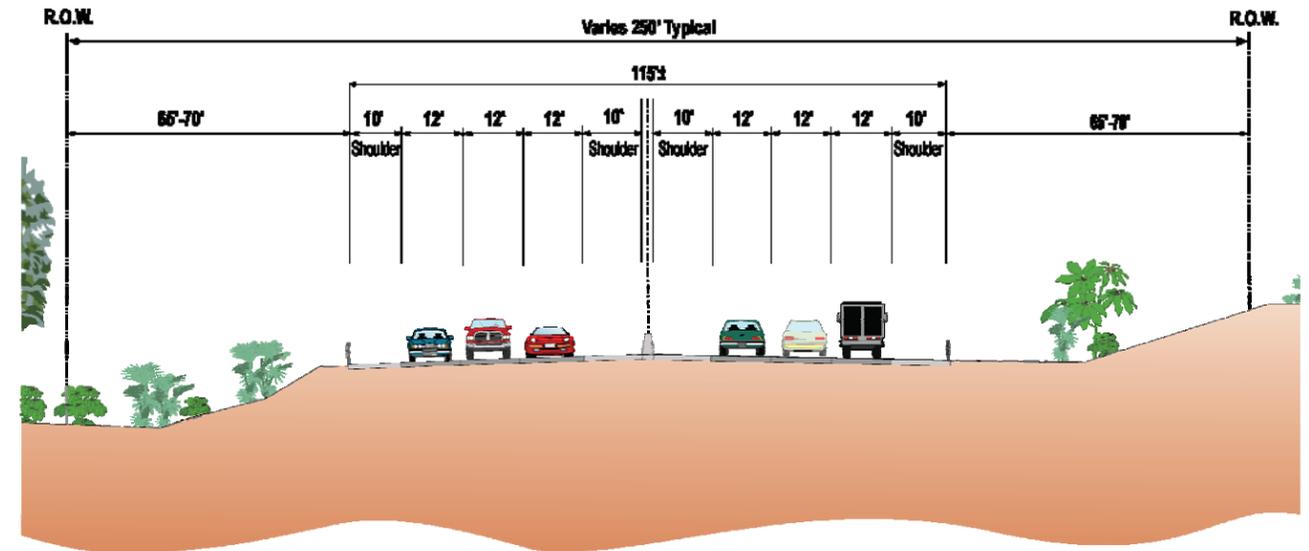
Existing Thruway Typical Cross-Section between Interchanges 15 and 11
